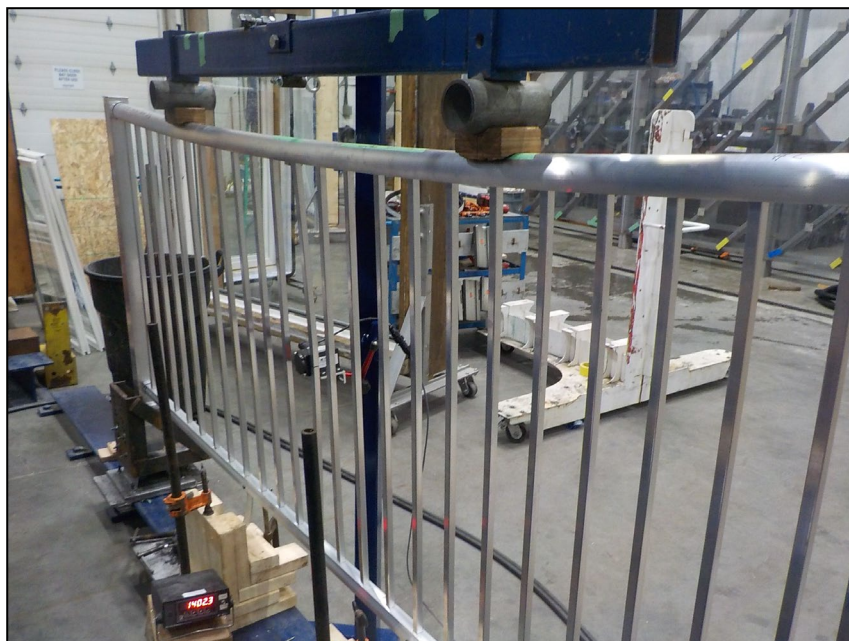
Century Welded Fascia: Vertical Uniform Load Test
